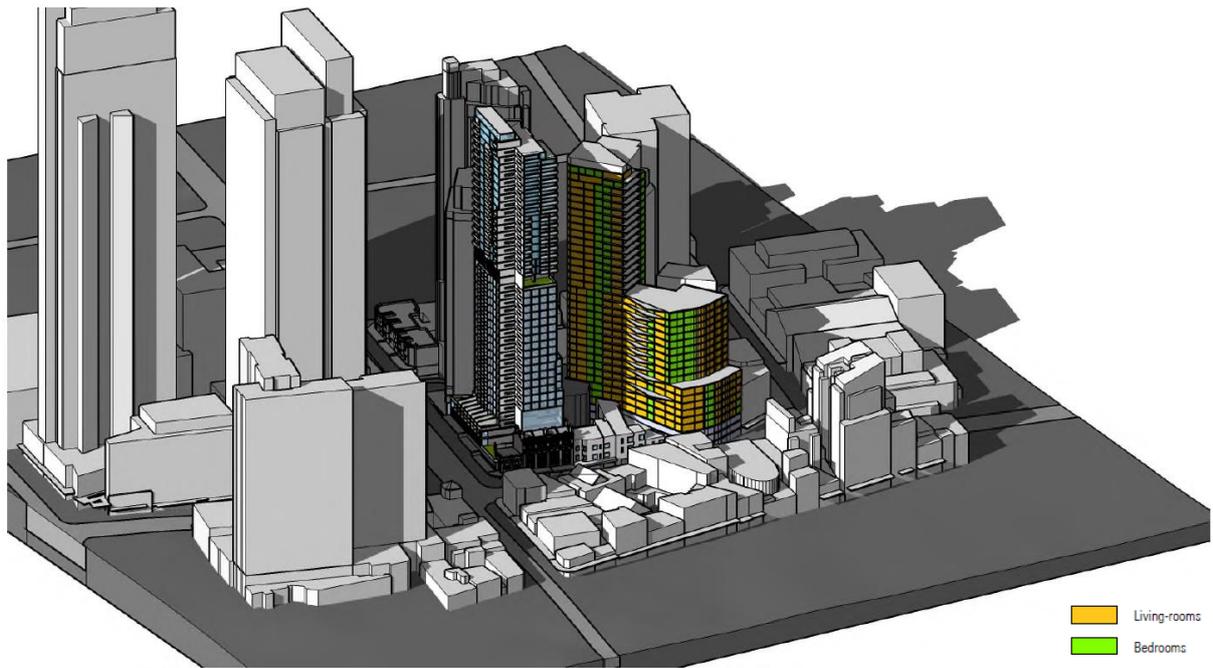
The original, indicative building envelope with shadows cast at 1pm midwinter.
